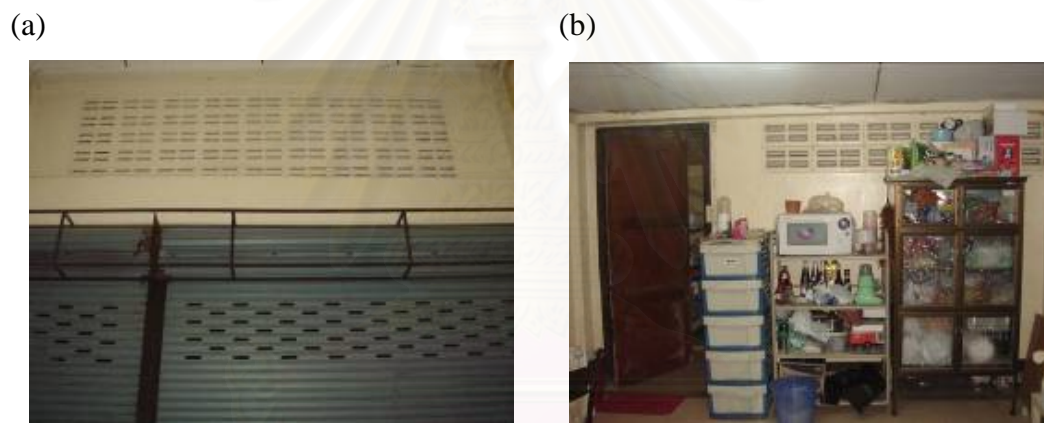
(a) Small vent holes above the front door and (b) back door downstairs on the first floor.
